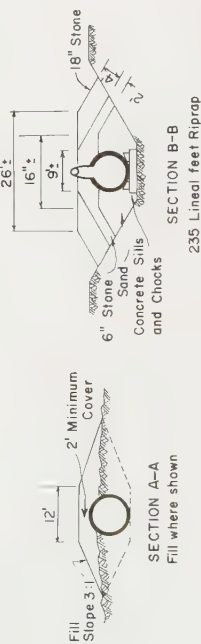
90-in. R.C. outfall, Coney Island Sewage-treatment Plant, New York.
